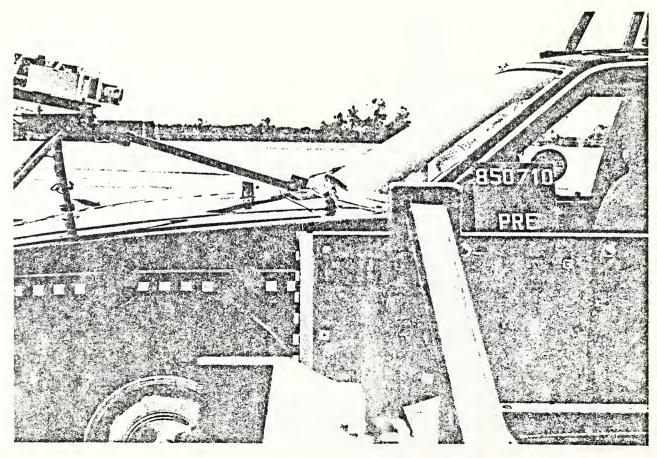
PRE-TEST CLOSEUP - VIEW 2
